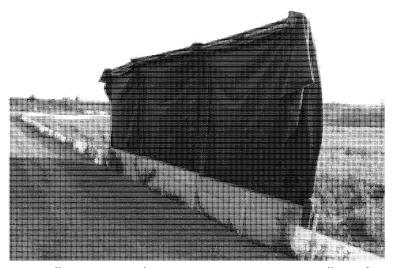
Woodbury Site - Overview of Site Activities (9/22/2009. Photo by William Westley.
